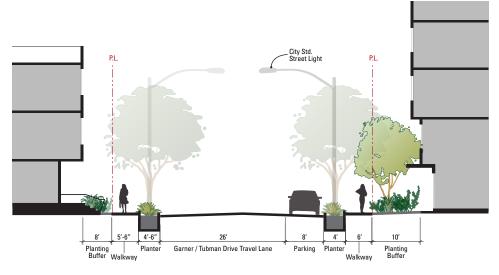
Section G. Garner Drive and Tubman Drive typical section
